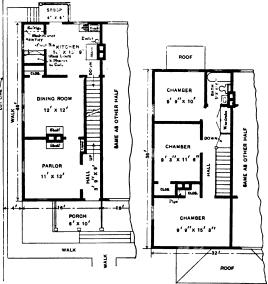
Half of First and Second Floor Plans Submitted by "F. D. C."
